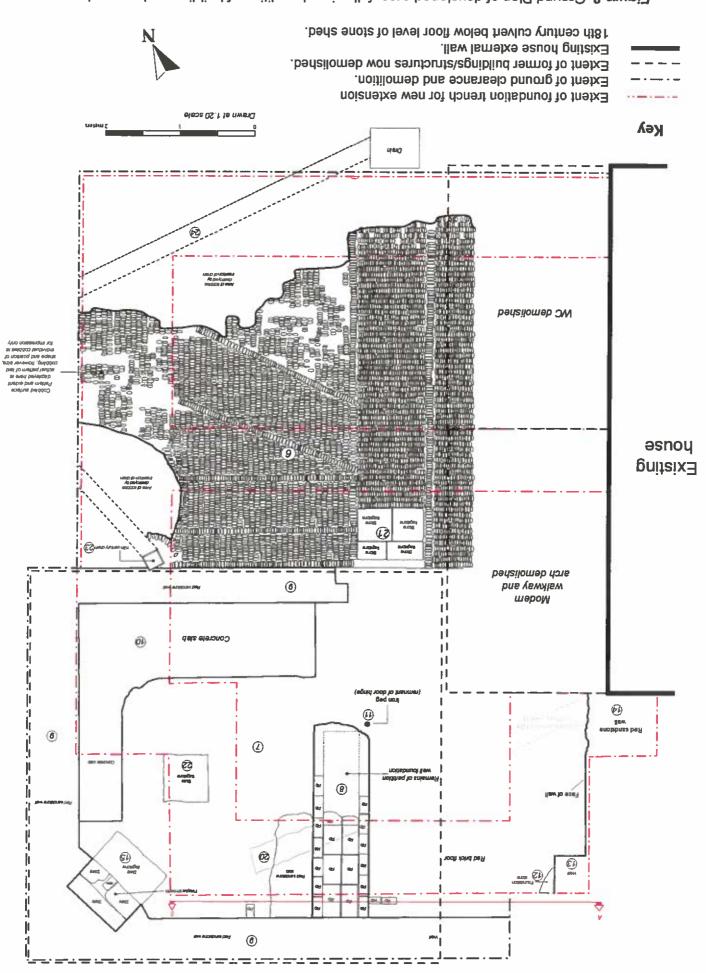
Ground Plan of developed area, following demolition of building and removal of concrete floor and tar mac and overburden. Foundation trench outlined in red.
